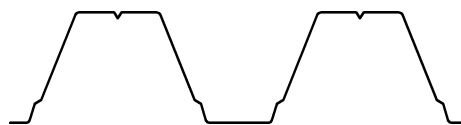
Part of typical trapezoidal profile with stiffened crown and web
